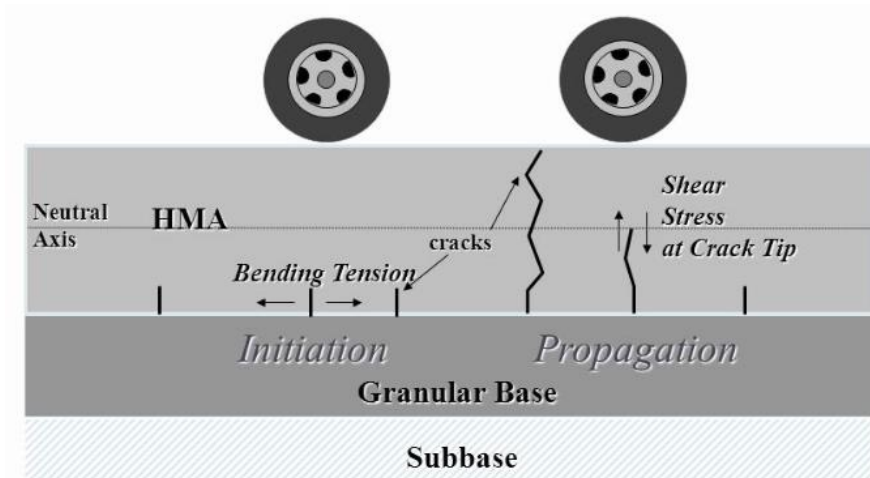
Bottom-Up Fatigue Cracking Mechanisms (NCAT Course Presentation, 2011)
